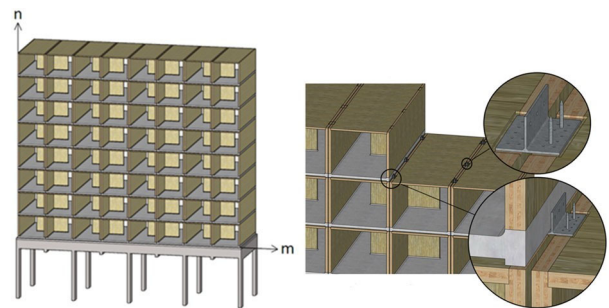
Structural design the modular structure (left) and the connection of the modulus during construction (right).
